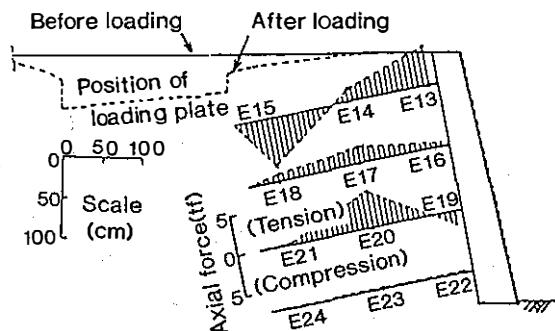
Location of footing and tensile-force in steel bars at the maximum footing load.
